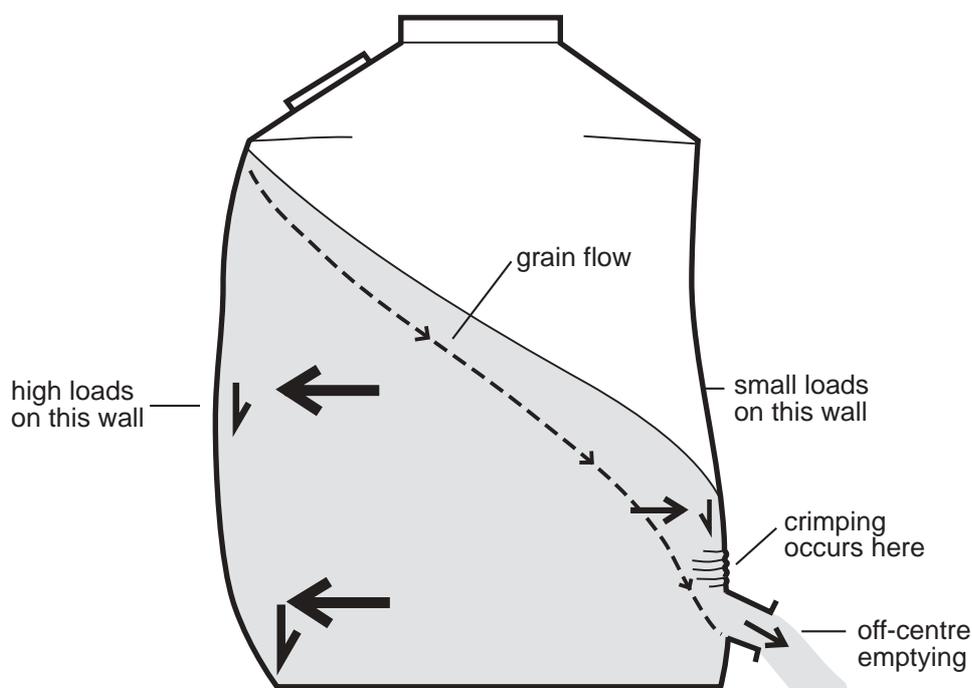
Off-centre filling or emptying causes uneven loadings on silo walls - a situation that could lead to failure.
